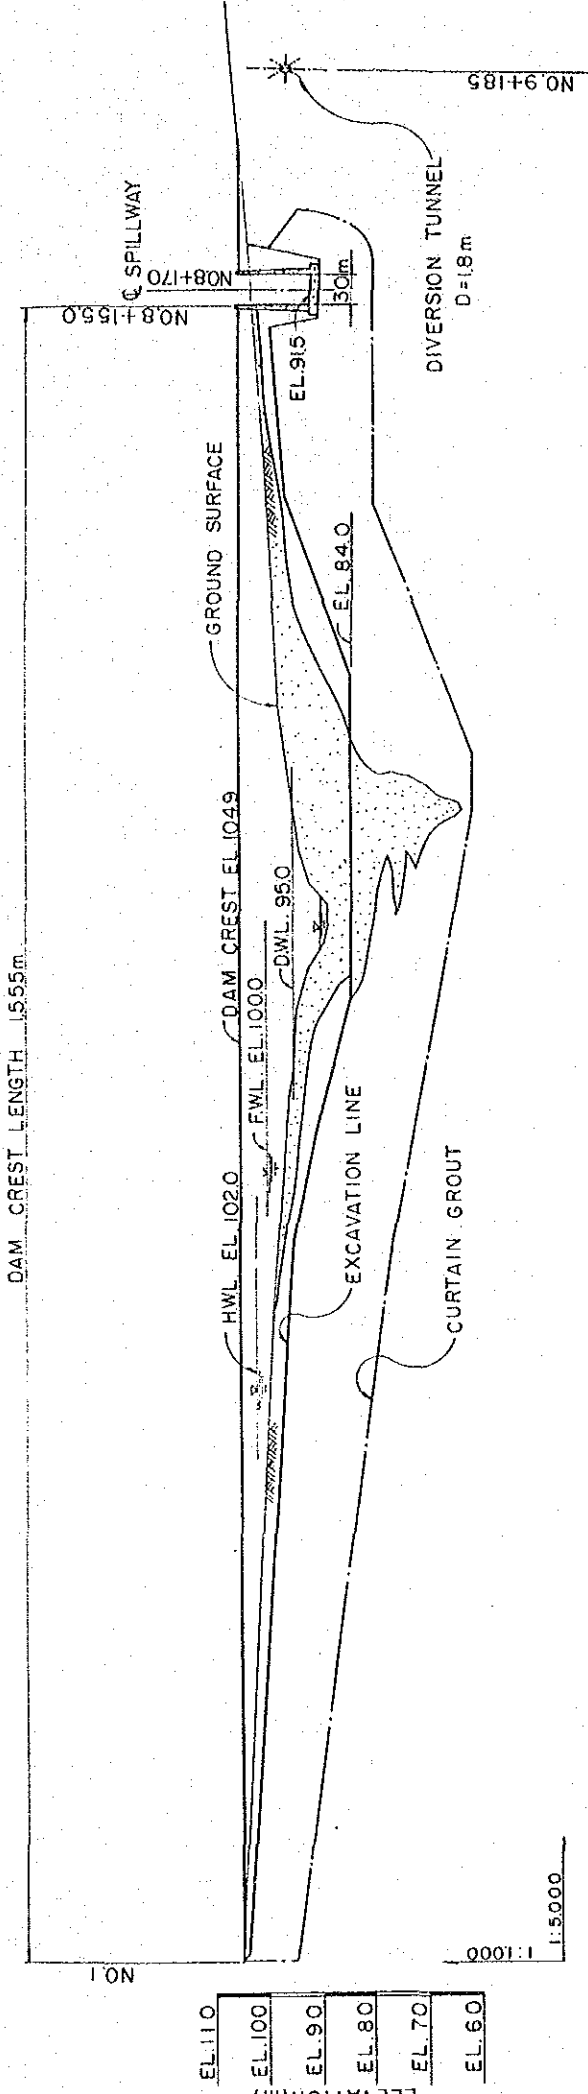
Typical Cross Section of Khlong Pho Dam
